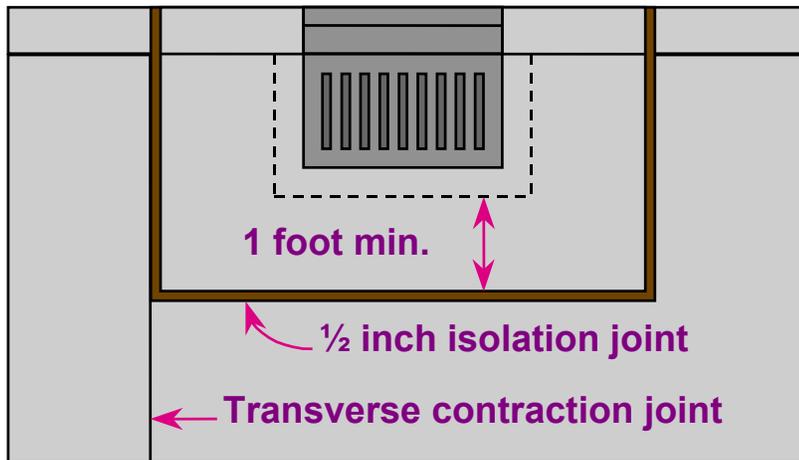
Example of an inlet adjacent to a transverse joint (figure courtesy of American Concrete Paving Association).
